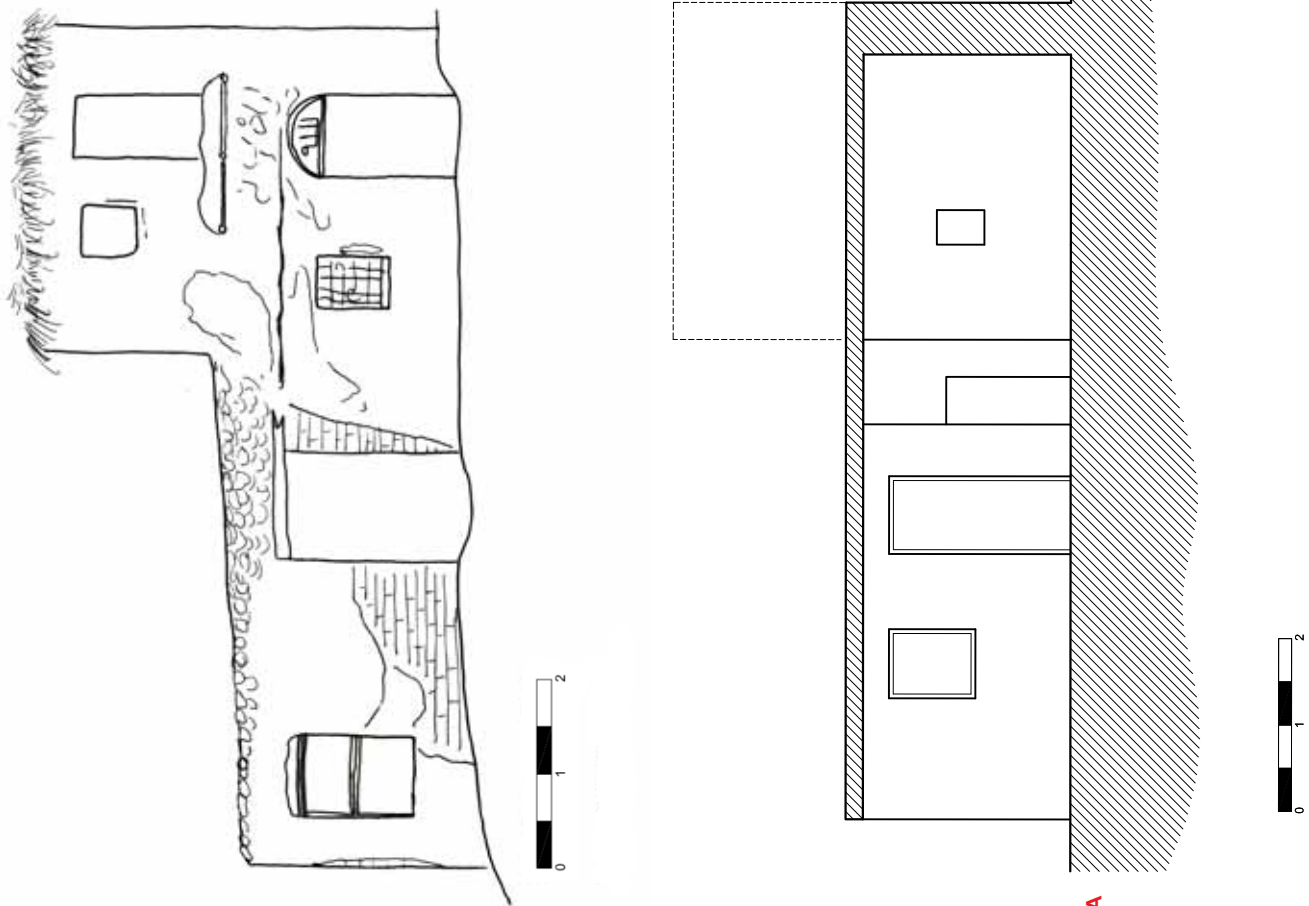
NAJ03. Top left: Front facade elevation
